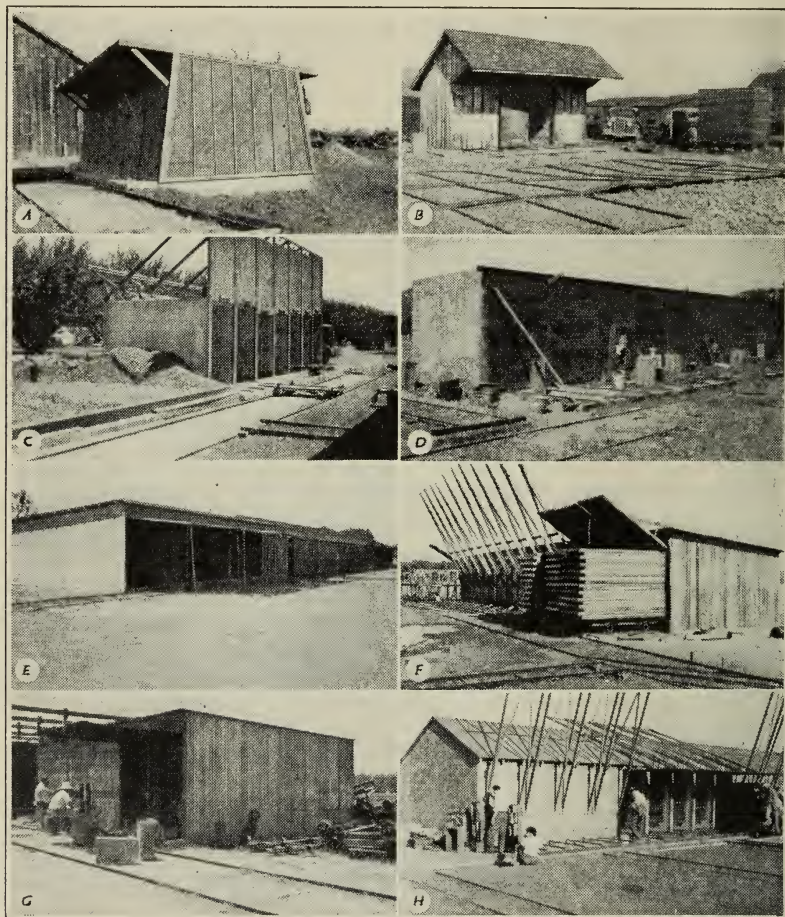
Typical farm sulfur houses of the better types: *A*, Well-built wood frame house with sloping front and rear walls, asphalt paper neatly applied over wood sheathing, and top-hinged doors, counterbalanced; *B*, wood frame house with overhanging roof and plastered interior; *C*, concrete house with vertical sliding doors; *D*, concrete house with side-hinged doors in a removable wood frame; *E*, large-capacity wood frame houses with top-hinged doors, such as used in pear drying; *F*, cumbersome overhead counter-balances for top-hinged doors on shed-roofed houses; *G*, four-car house in tandem-parallel arrangement; *H*, stucco and plaster houses of tight construction except for excessive ventilation.
